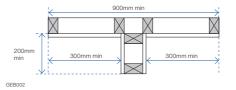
WALL INTERSECTION (GIBFIX® FRAMING SYSTEM)
